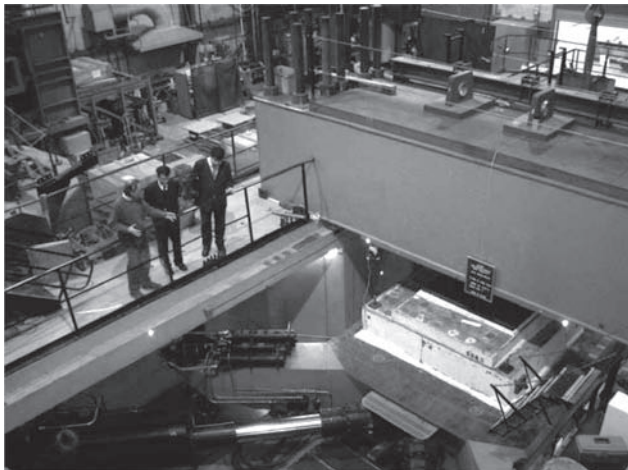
Disk bearing undergoing testing at SRMD test facility.
